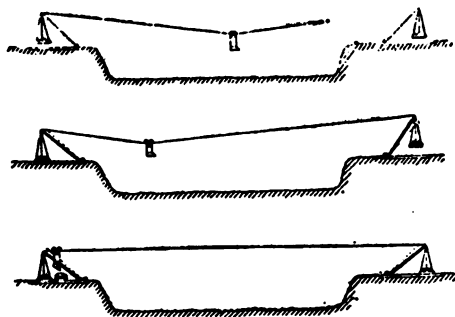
Balanced Cable Crane Horizontal Cableway.
